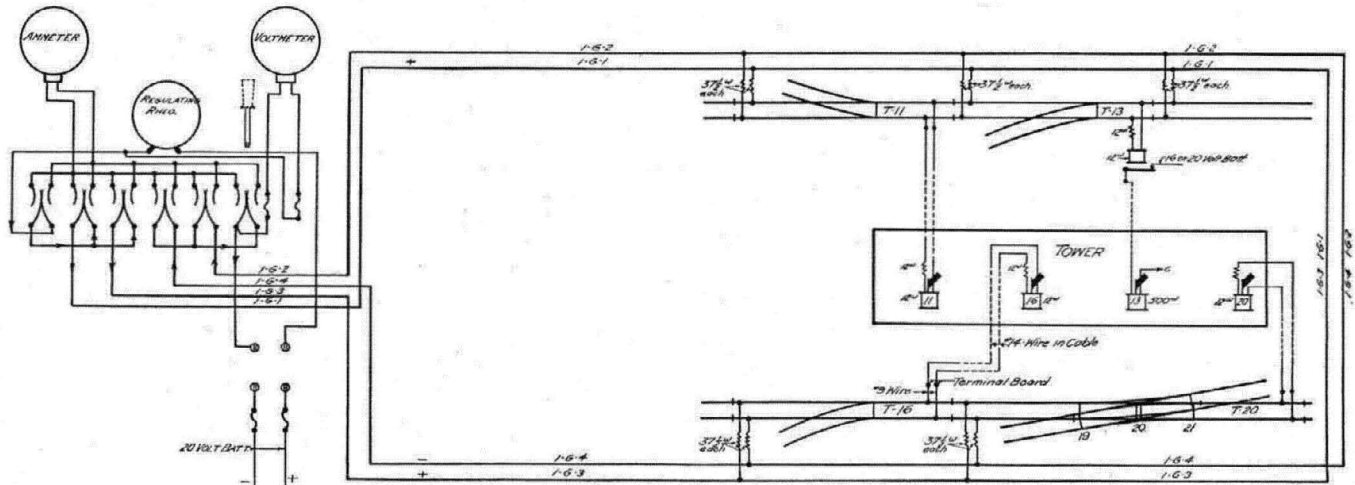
Diagram of Typical Track Circuit Feed Arrangement for Interlocking Plant.
